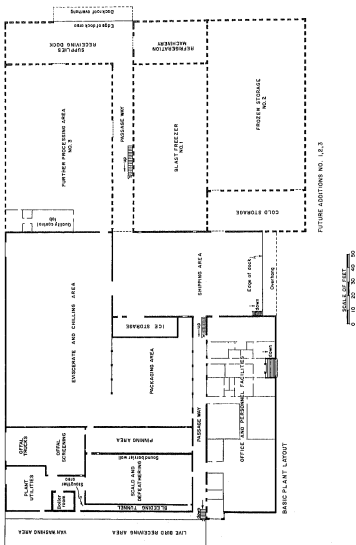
Basic plant layout for turkey processing plant and three additions for expansion.
